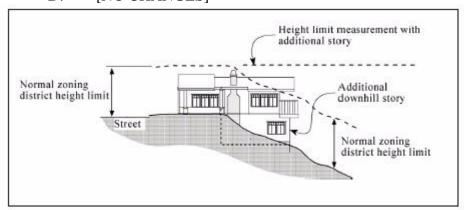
ADDITIONAL BUILDING HEIGHT ON DOWNHILL LOT
